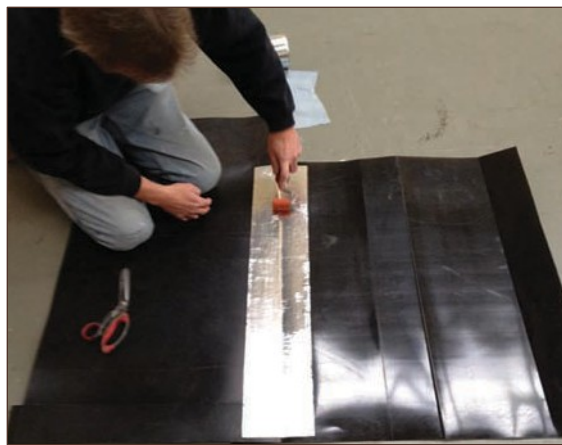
Example HDPE type gas membrane and steam roller used to ensure self-adhesive tape is correctly installed (courtesy A Proctor Group)
